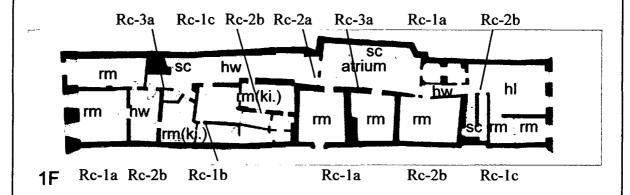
20 Rule B for the floor plans at Stadtplatz No. 21 in Steyr
